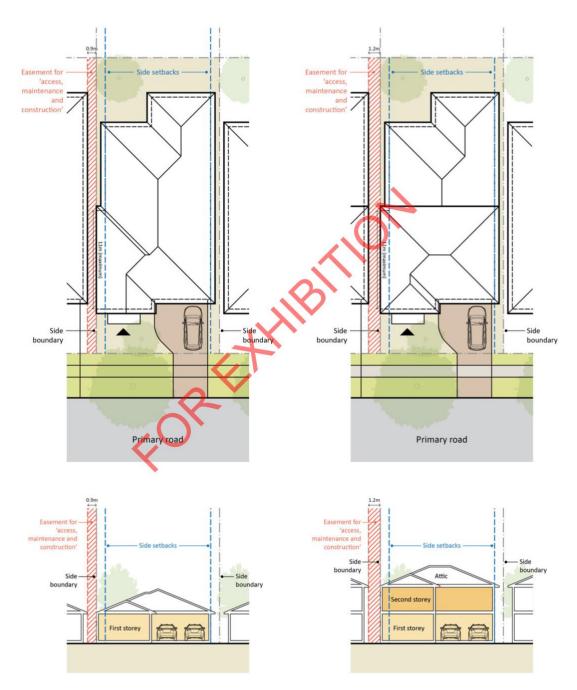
Easement requirements for zero lot line development (plans and primary road elevations)
